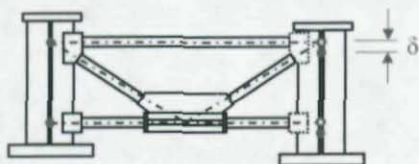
SDLF or TDLF concept 1 – lack of fit between girders and cross-frames in no-load geometry.
